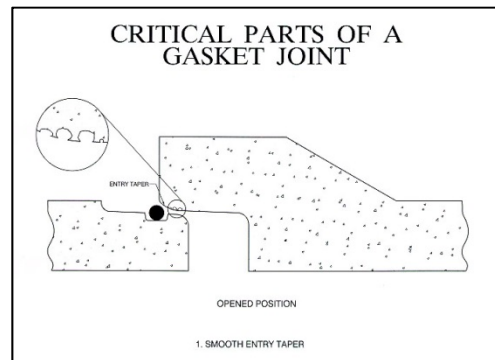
Illustration of critical parts of a gasket joint that have a defect in the sealing area of the joint.
